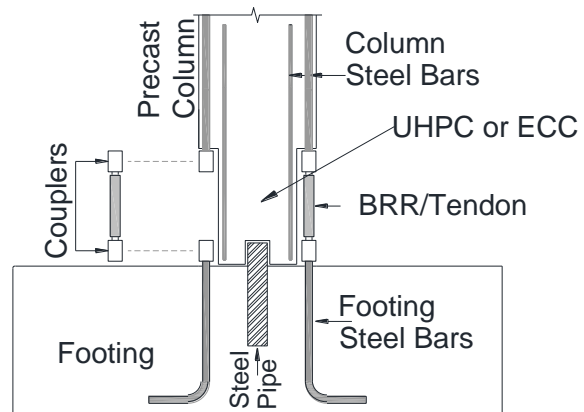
Twenty Detailing Alternatives for Repairable Precast Bridge Columns
